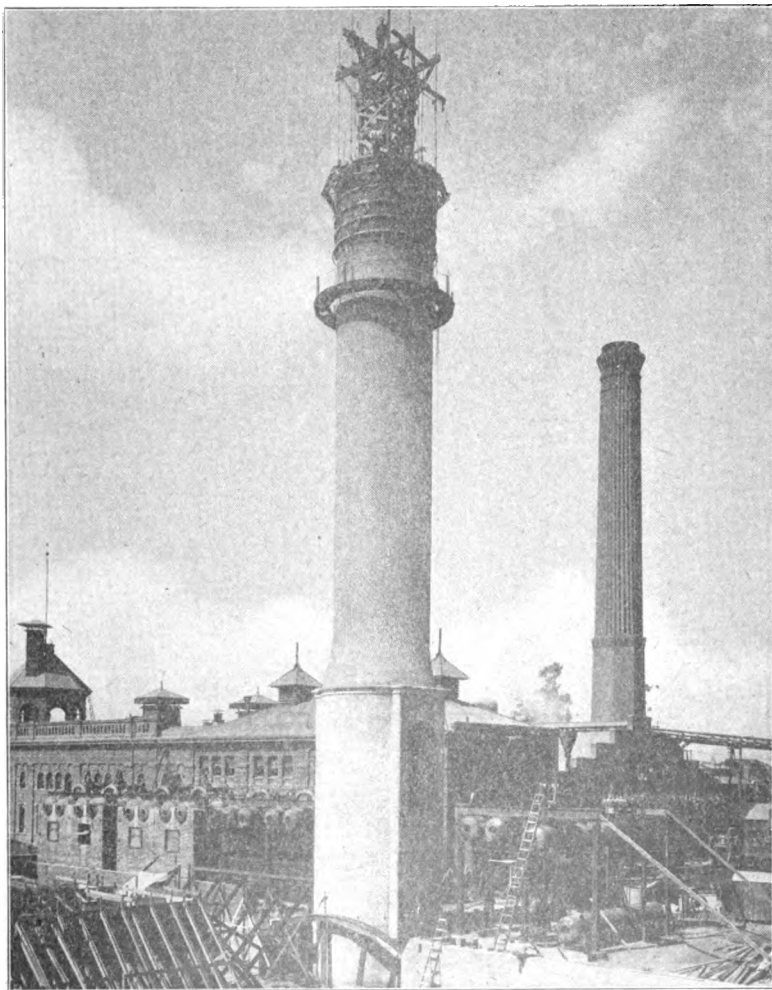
Reinforced Concrete Chimney, in course of erection, Los Angeles.
